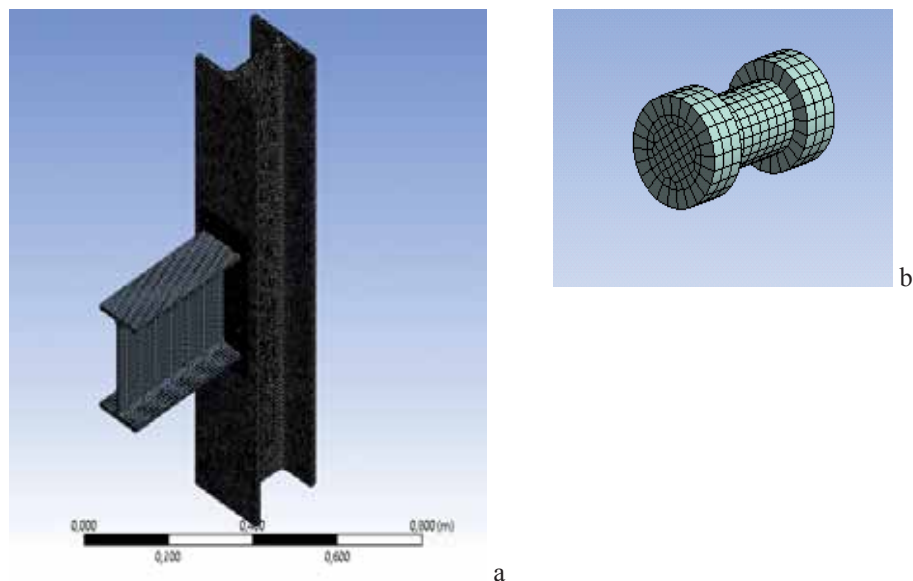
Finite element models: a) end plate-beam-to-column-connection, b) bolt.
